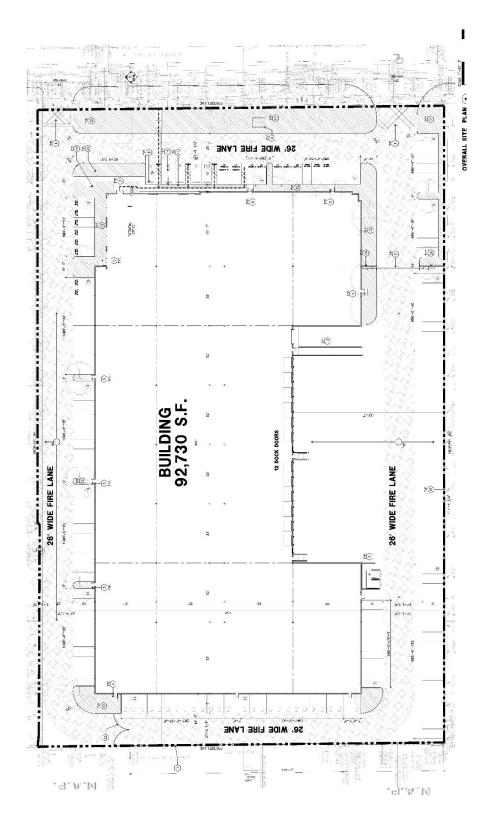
CONCEPTUAL SITE PLAN Source: HPA Architects
